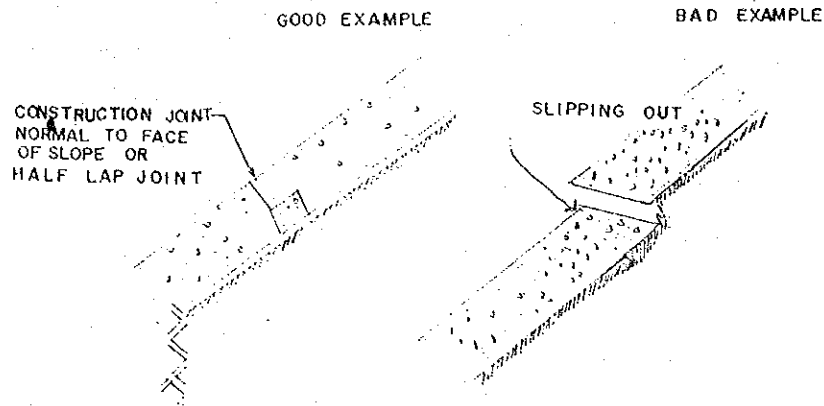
CONSTRUCTION JOINT OF CONCRETE PITCHING
